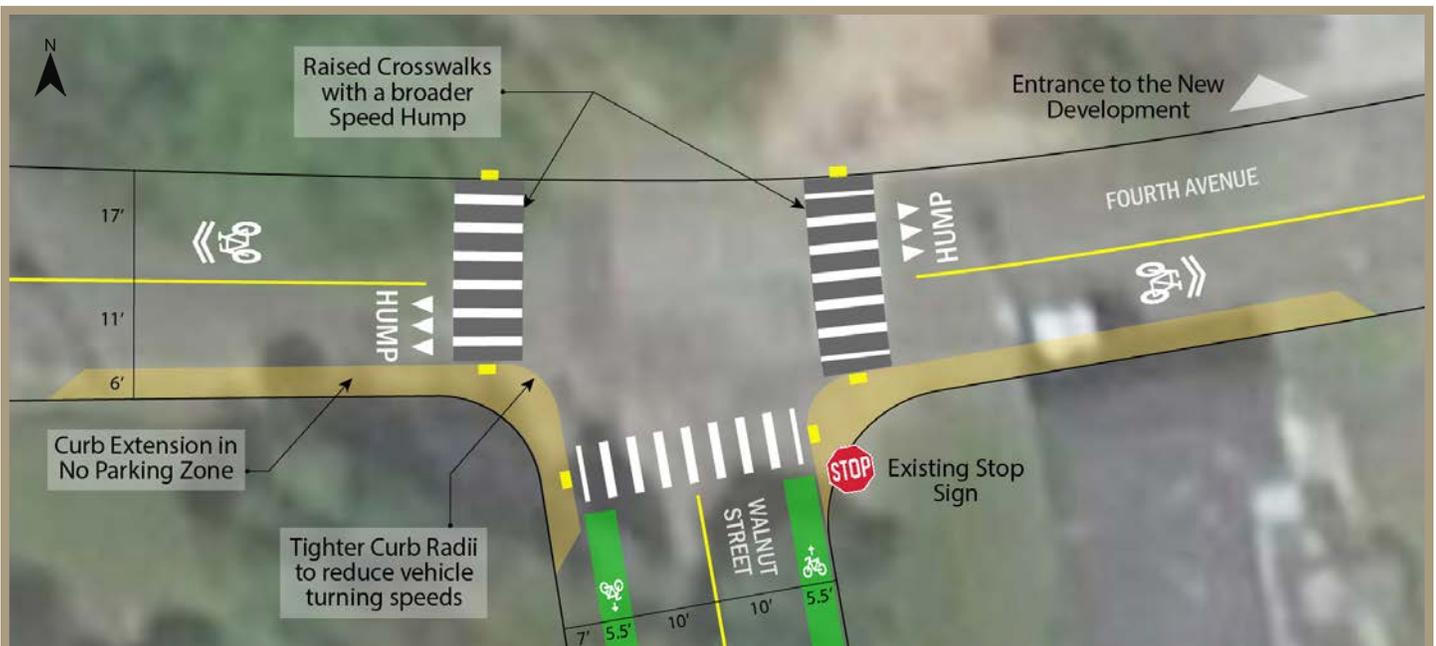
The intersection of Fourth Avenue and Walnut Street with proposed bicycle improvements.
